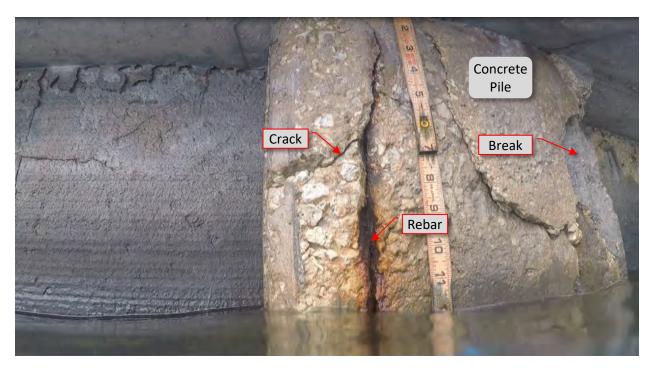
P29. STA 4+92. Cracked and spalled west flange, south face and east flange, rusted rebar, and loss of concrete at pile.
